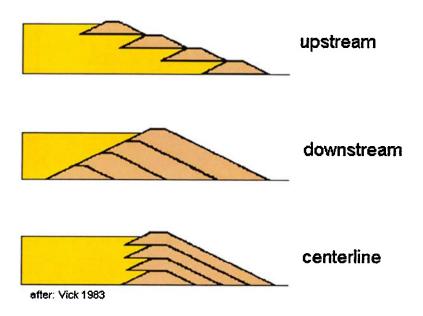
detailing various methods of building a Tailings Dam<sup>1</sup>
